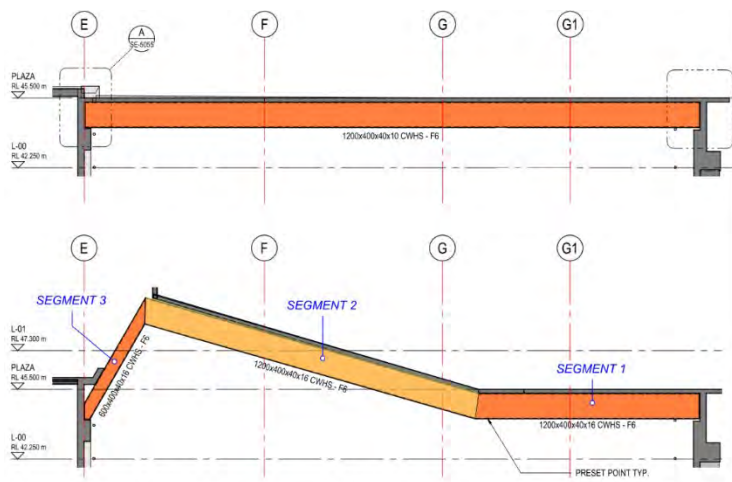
Type 1 box girder (top) and a Type 2 box girder (bottom).
